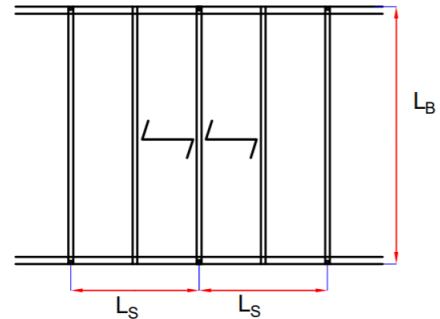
Structural Scheme for Group Office with Composite Slab floor system.
